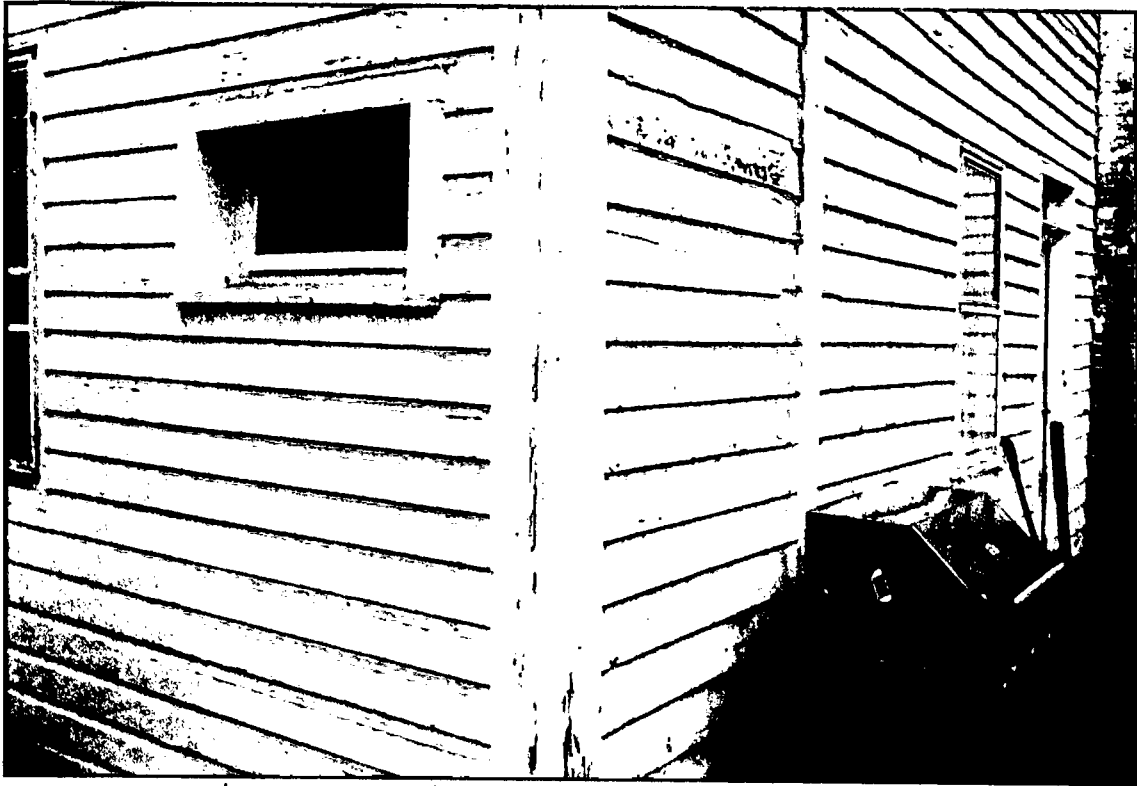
DETAIL - REAR / SIDE ELEVATION OF INSIDE CORNER ADDITION -
